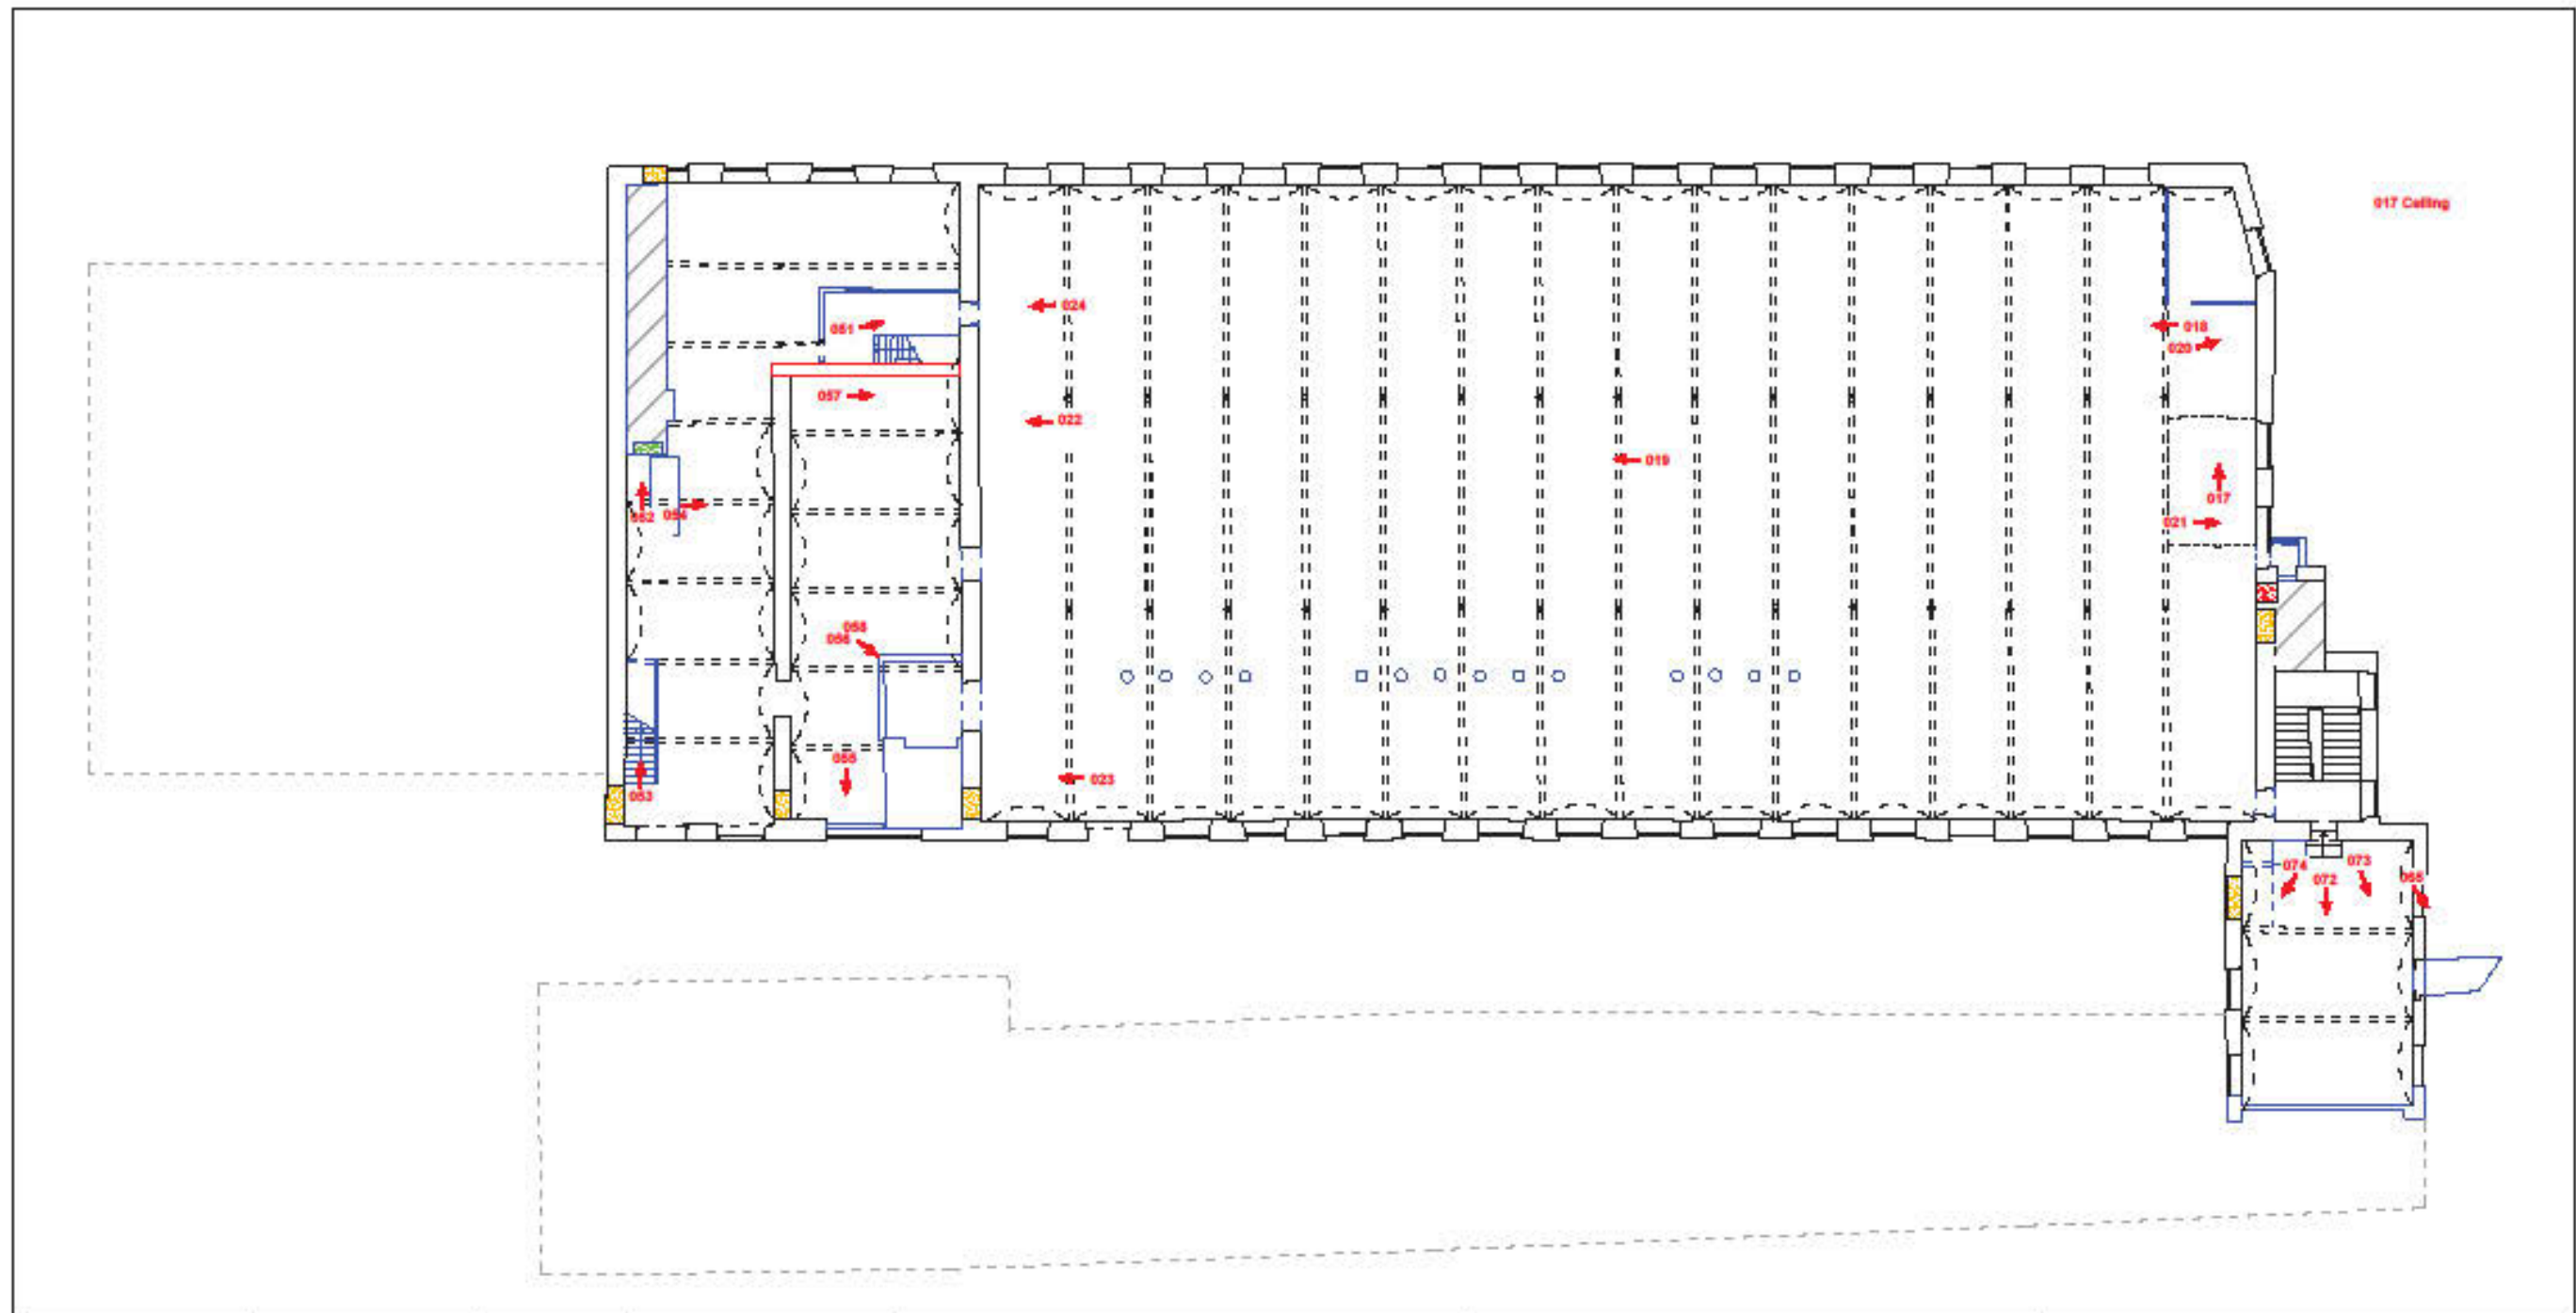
Ground Floor Plan of Woods Mill, showing buildings as referred to in the text
